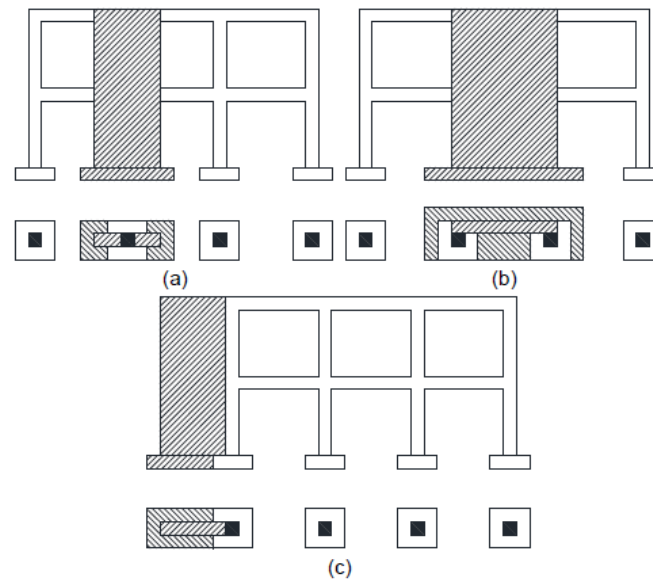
View and cross-section above the foundation of RC frames strengthened with new RC walls placed around a column (a), external to the frame (b), or as buttress (c); Source [39].
